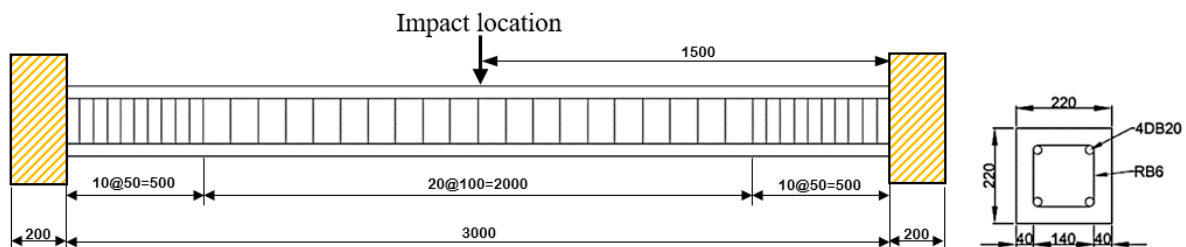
Cross-section and reinforcing detail of the RC specimens (unit: mm).
